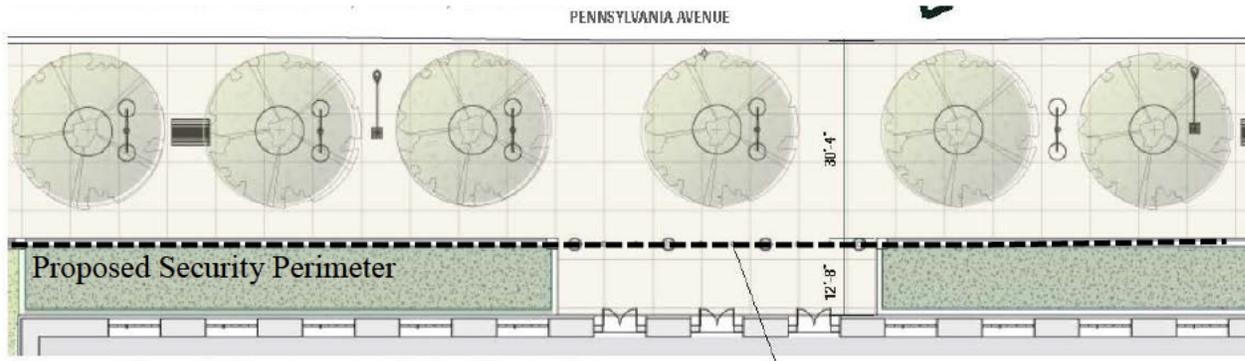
White House Visitor's Center Entrance and Security Perimeter – Site Plan
